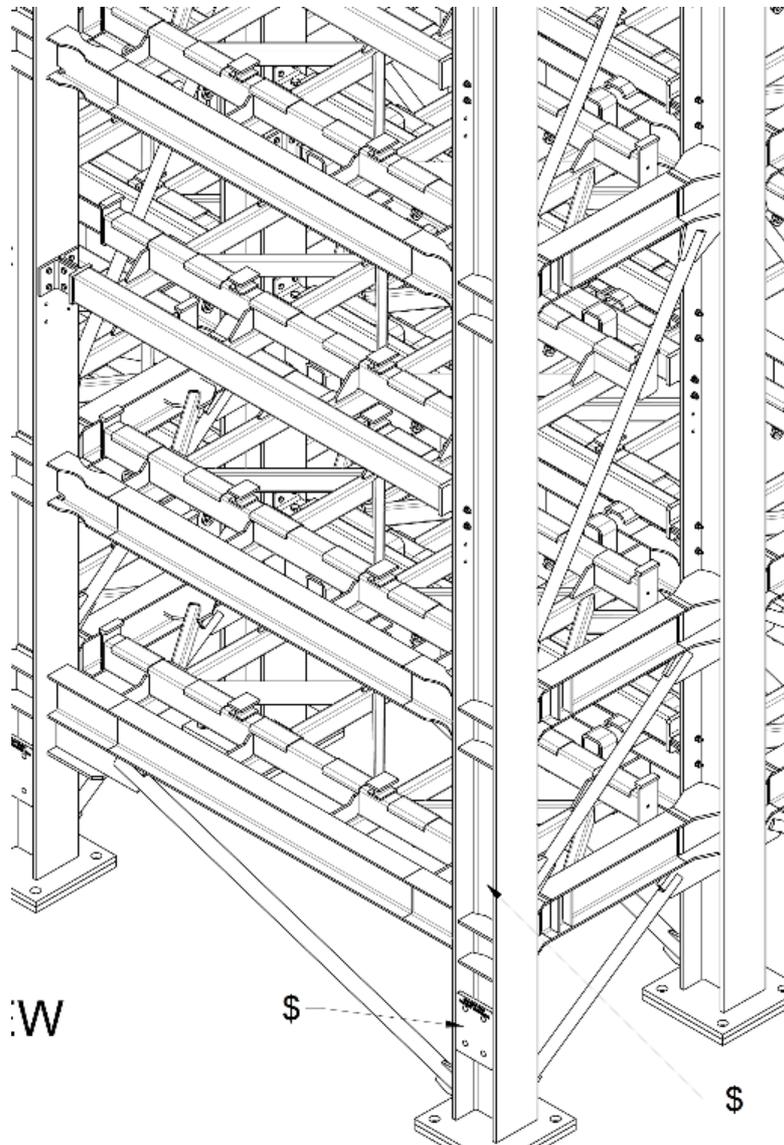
Storage Rack with Ductile Bracing and reduced beam section
